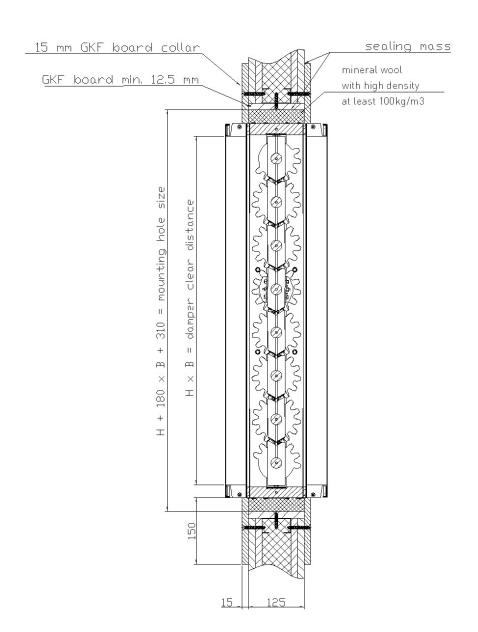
Installation method of fire dampers WKP-O in standard wall with 125 mm thick
